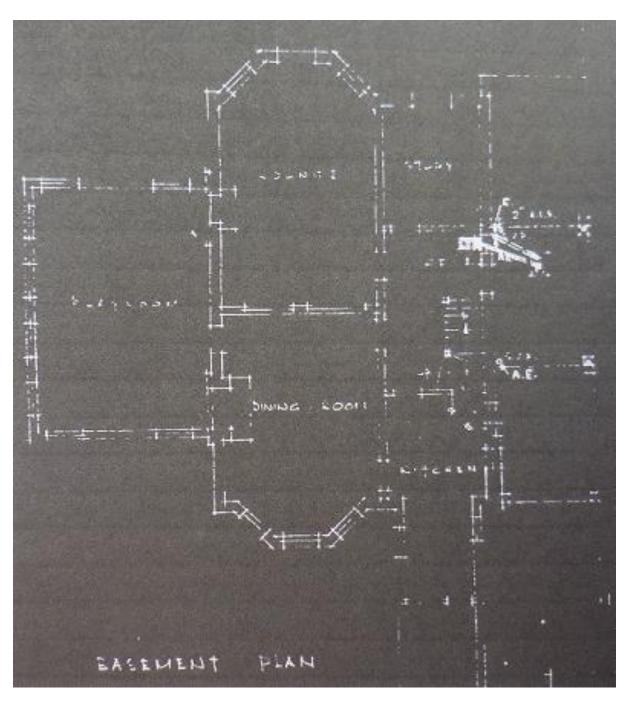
The plan of the basement storey in 1946, from a drainage plan (Camden Local Studies)
